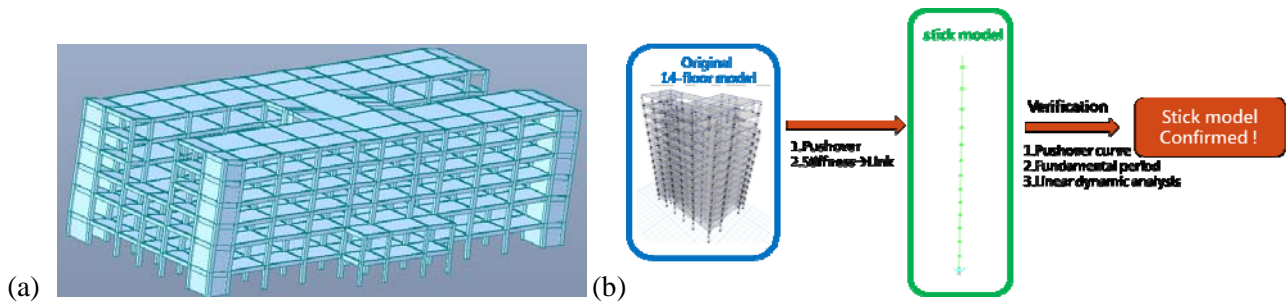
Numerical models of Buildings -- (a) the sample RC hospital; (b) a 14-floor SC building
